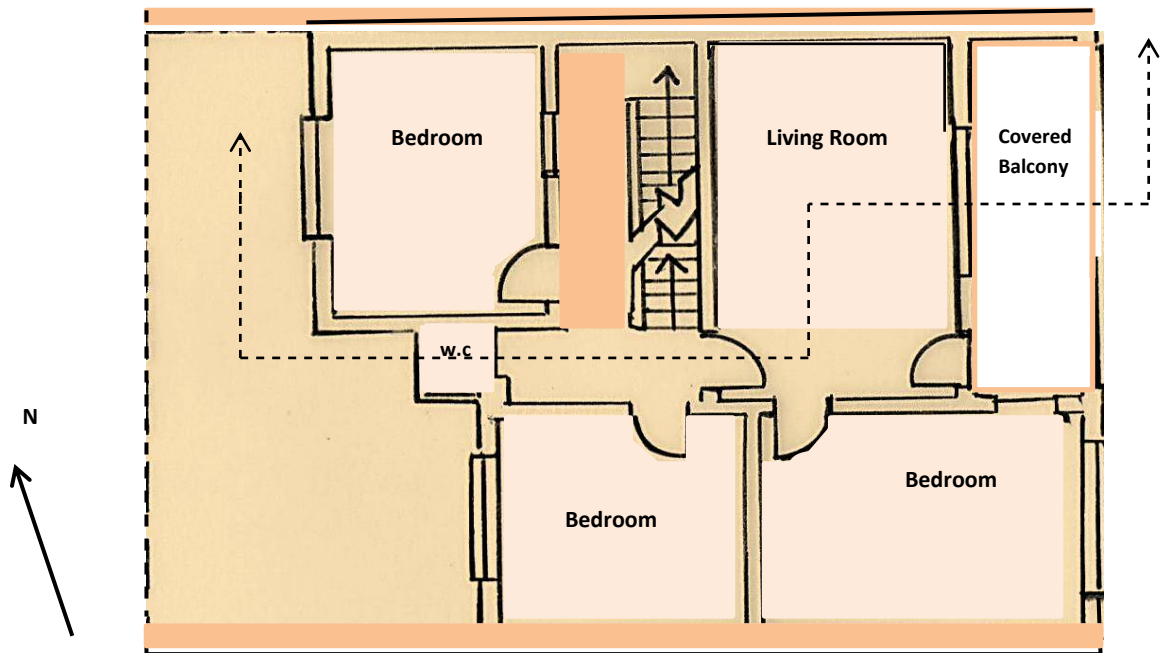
First floor level plan of the selected modern house. Scale: 1:100 (Researcher)
